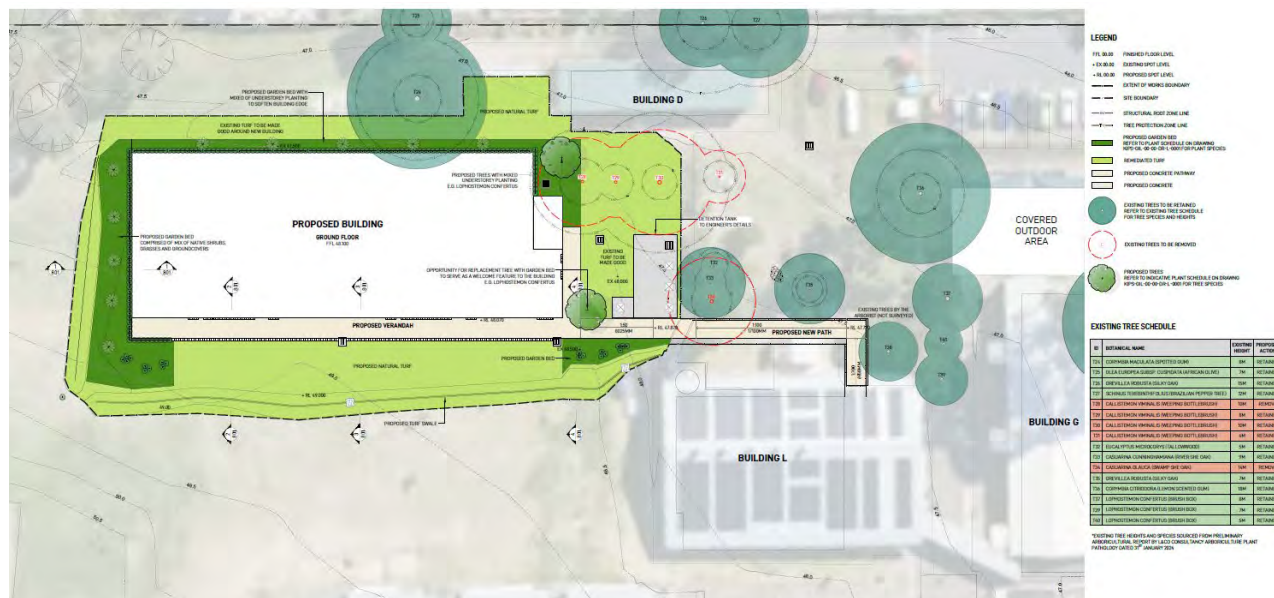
Detail from, Landscape Plan 1, Dwg. No. KIPS-GIL-00-00-DR-L-3001, Rev. K. Ground Ink, 24 February 2025.
